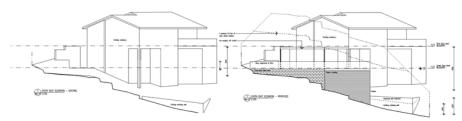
Existing and Proposed South East Elevation (B Turner, 2022)
